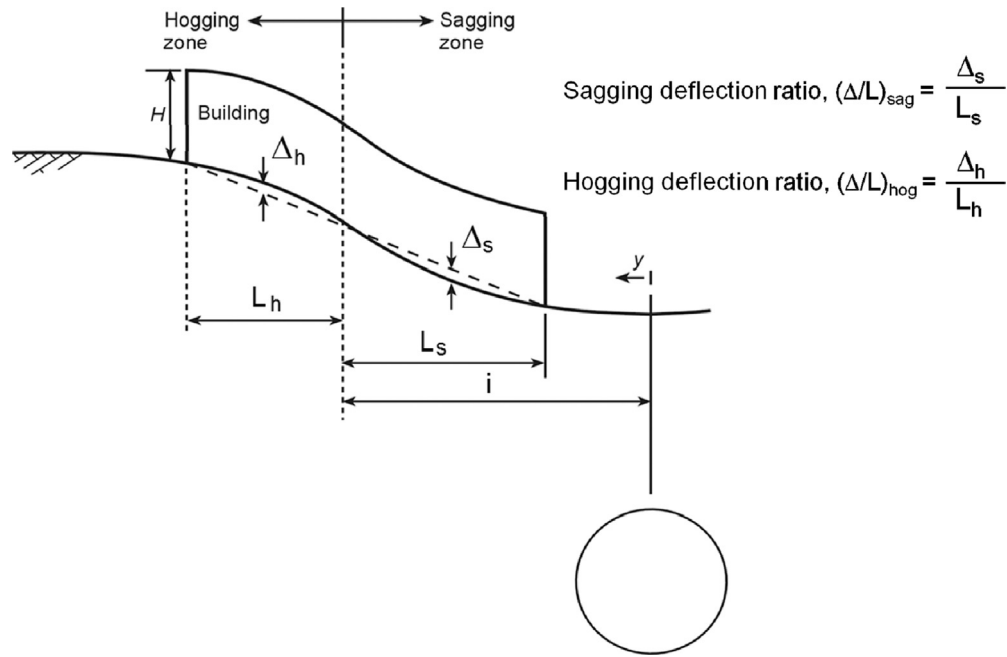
Deformation of building above tunnelling (after Mair et al., 1996)
